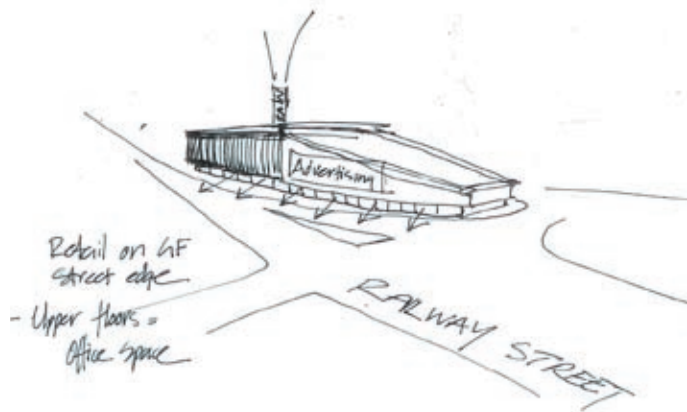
sketches illustrating how built forms are to address the street edge
